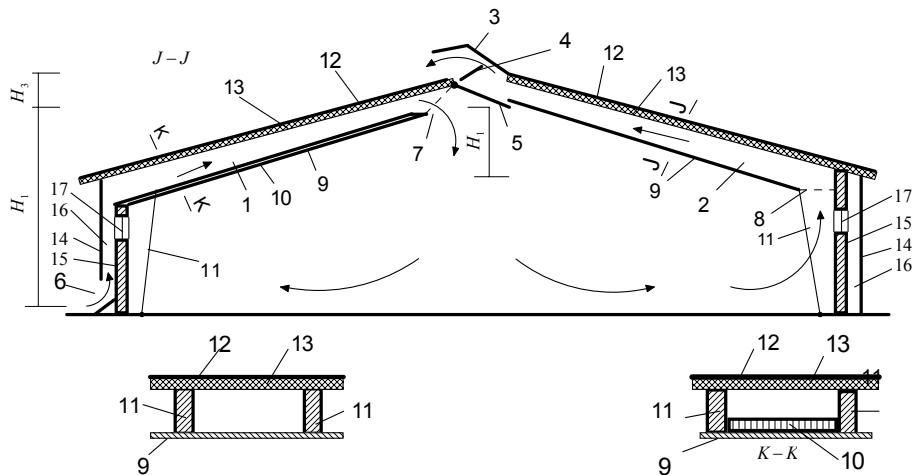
Reconstruction scheme of panel sectional livestock building:
